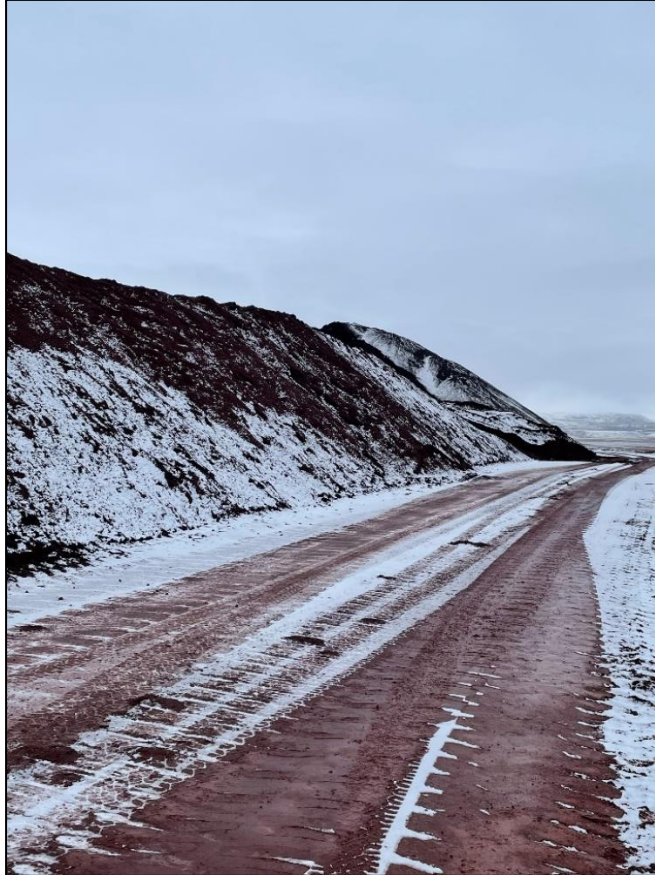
Edge of the Lump Stockpile along the East Side Access Road.
